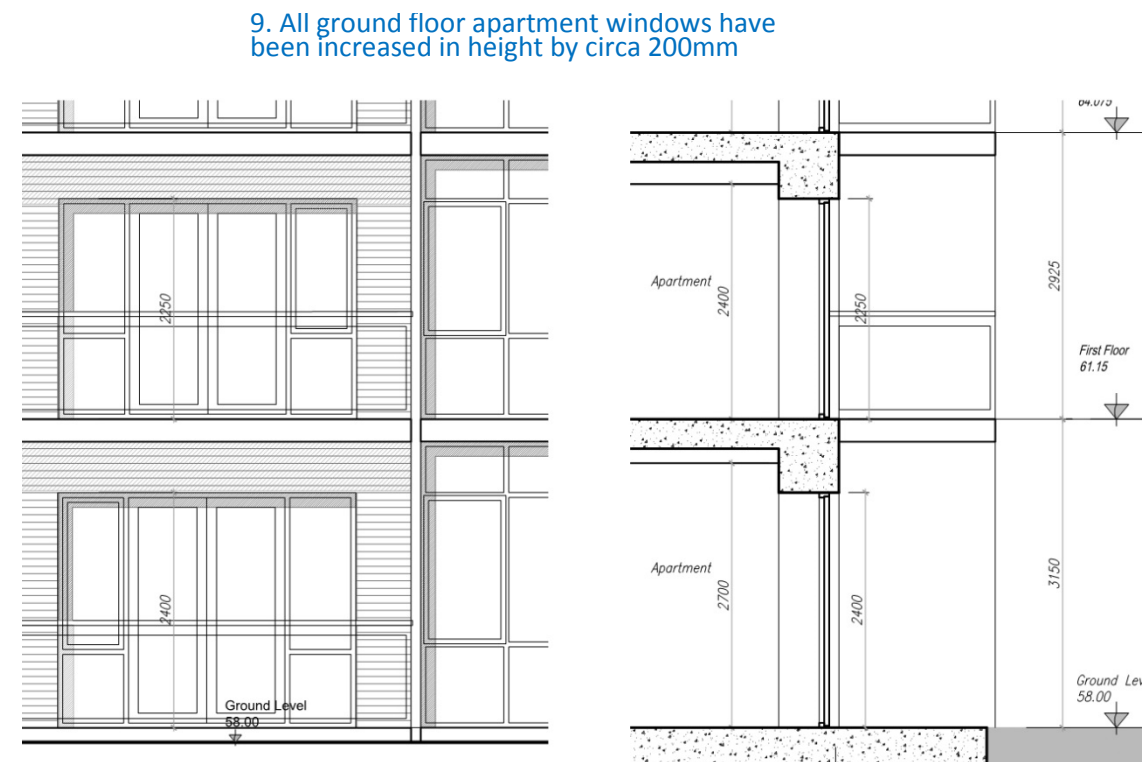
Part Elevation & Section Indicating 2.4m High doors and windows.
